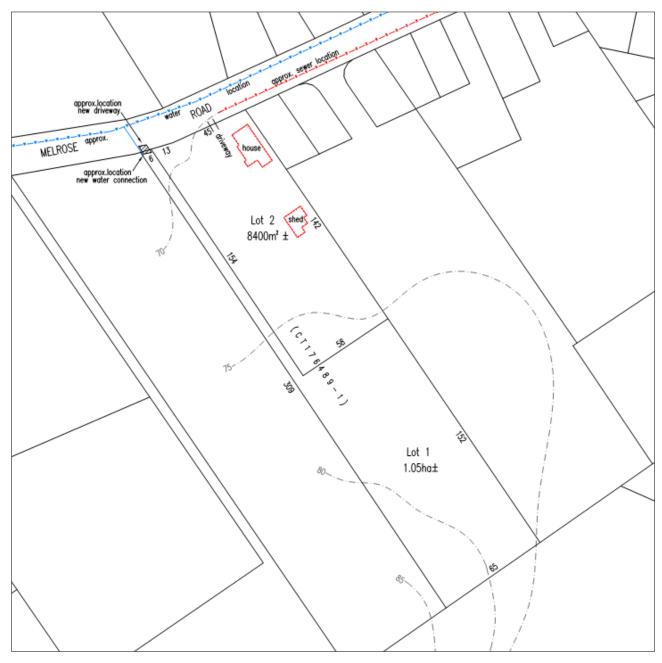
Subdivision Plan (Michell Hodgetts, 2020)
